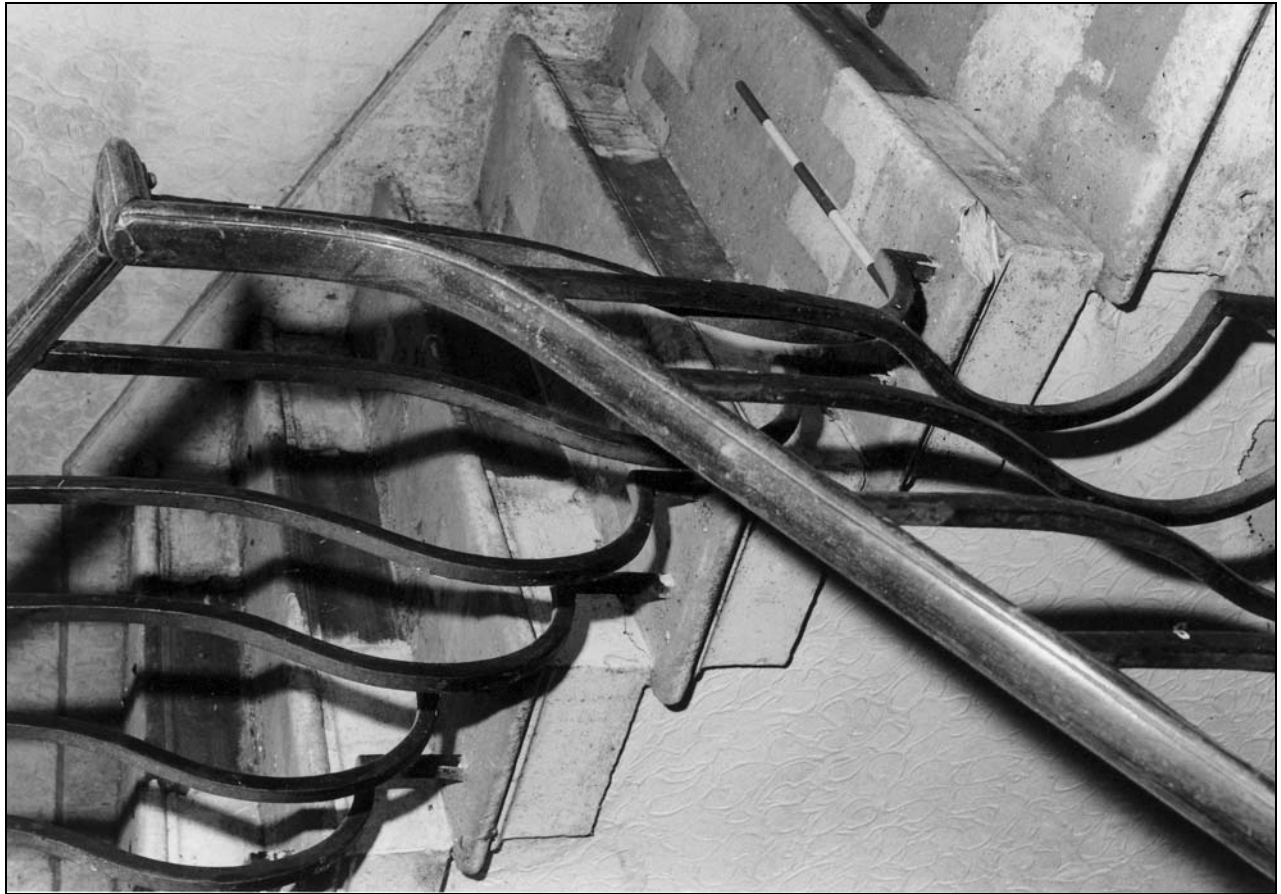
South wing: detail of handrail to staircase in entrance hall G11 (film 2, frame 10)
